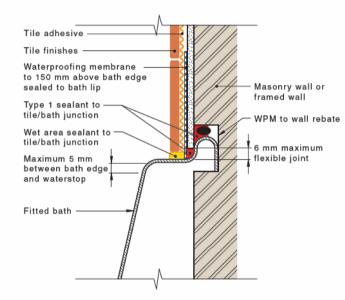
(A) — Shower over bath — Fitted bath — Framed or masonry walls
